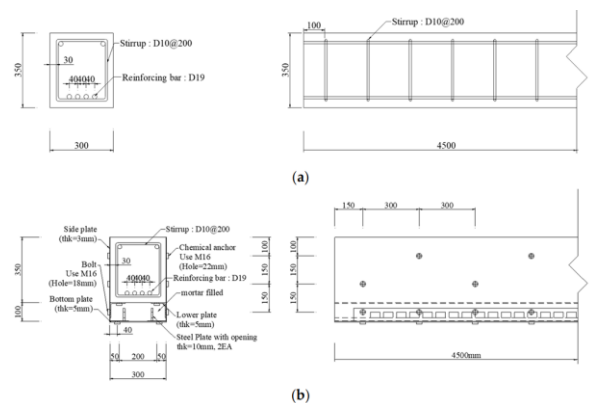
Dimensions of the beam specimens tested in study [30]: (a) reinforced concrete beam specimen without strengthening; (b) reinforced concrete beam specimen strengthened with a steel jacket along the side faces and lower face
